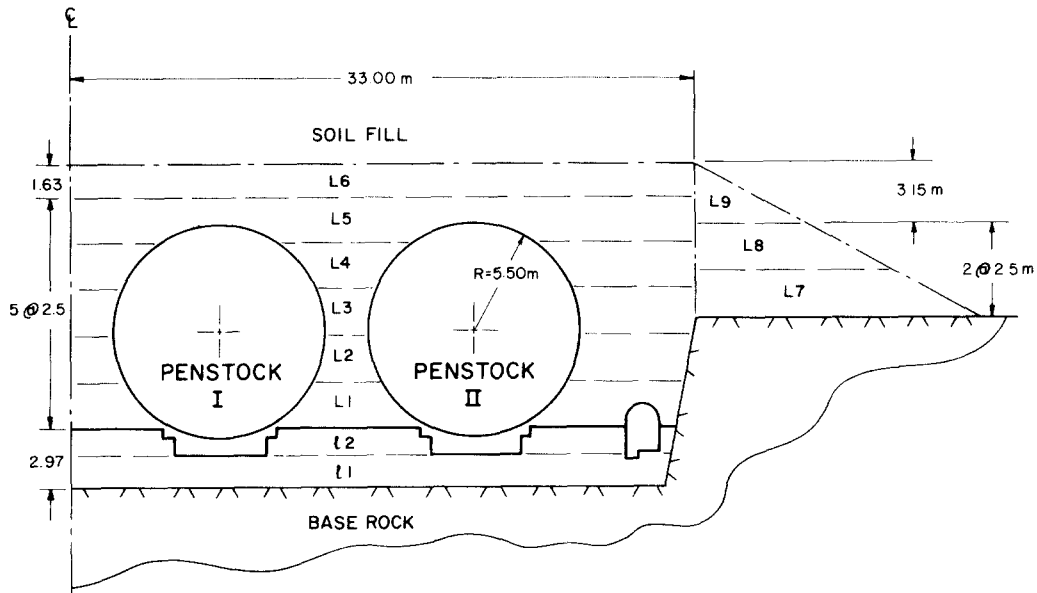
Transverse section of the penstock structure showing concrete placement sequence.
